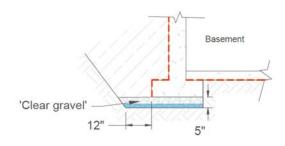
Example of Building Code "Option B" for foundation drainage system (NOT recommended by best practice).
